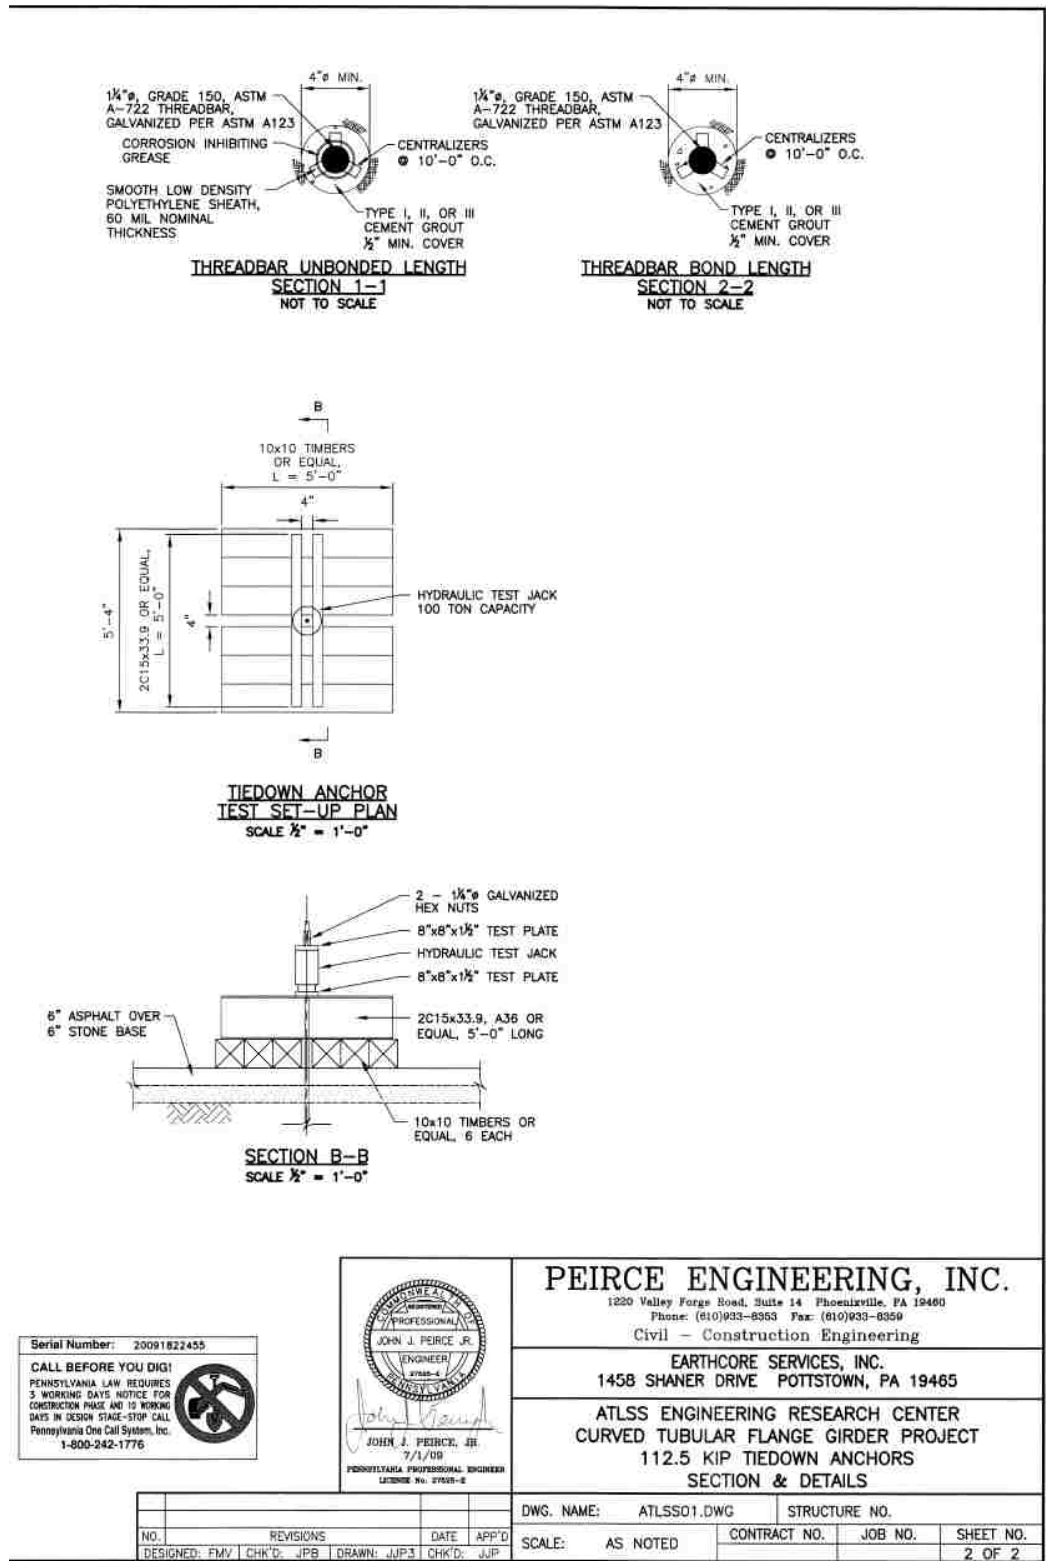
(cont'd.): PE ground anchor rod drawing, sheet 2 of 2 (PE, 2009a)
